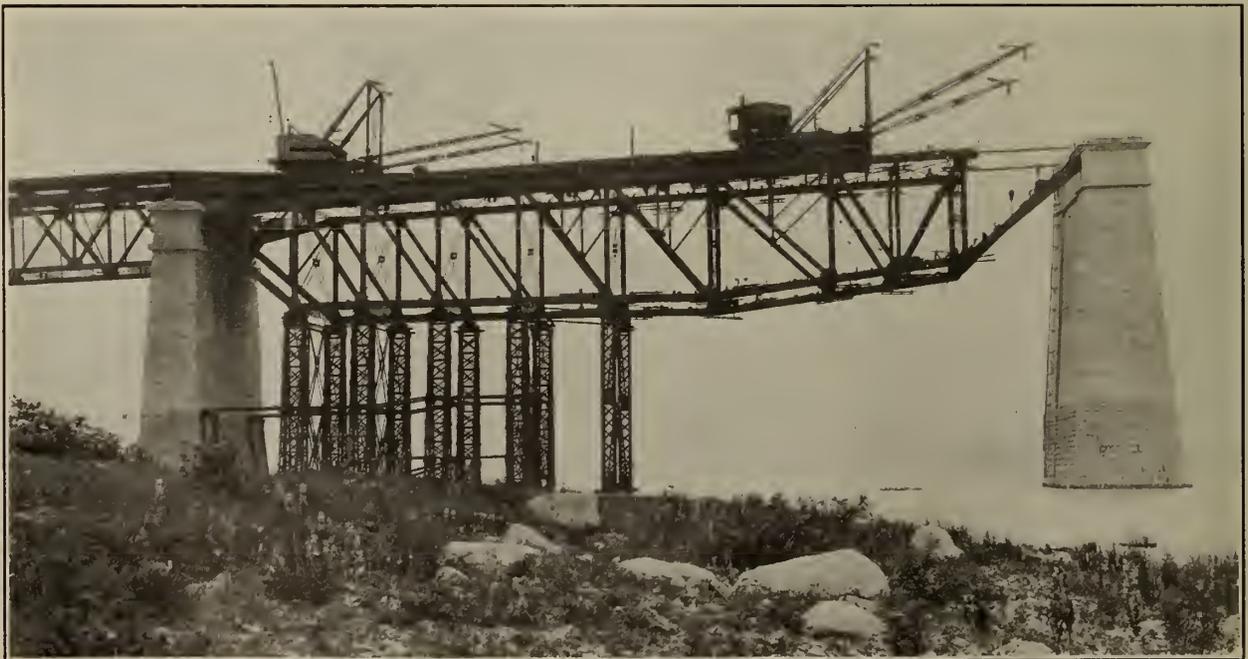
Main Span, South Side—Erecting Falsework Span under Anchor Arm—Second Stage.
